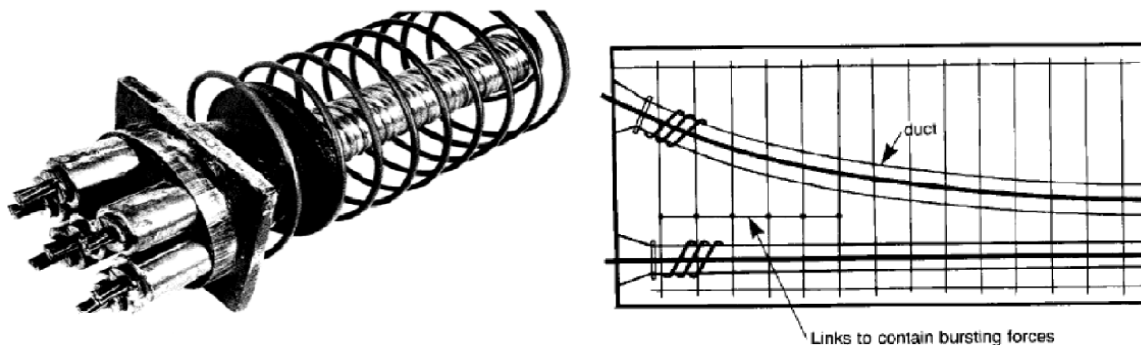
a) Tendon anchorage b) Reinforcement of end of a post-tensioned member
